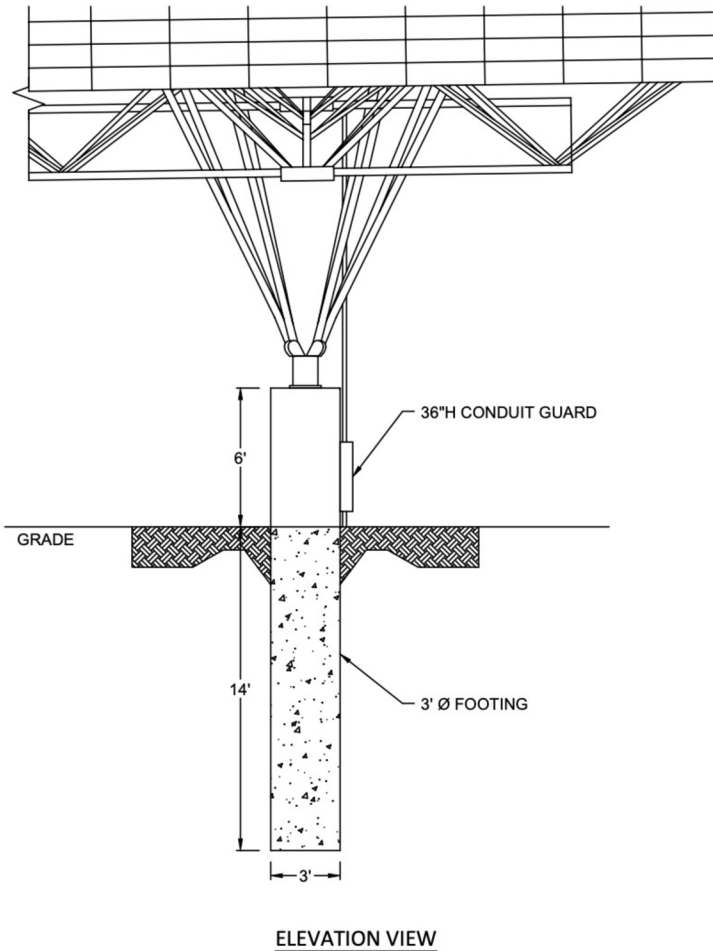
Smaller canopies may be supported by concrete piers buried in firm soils, (Drawing credit: Brock Gibian, used with permission)
